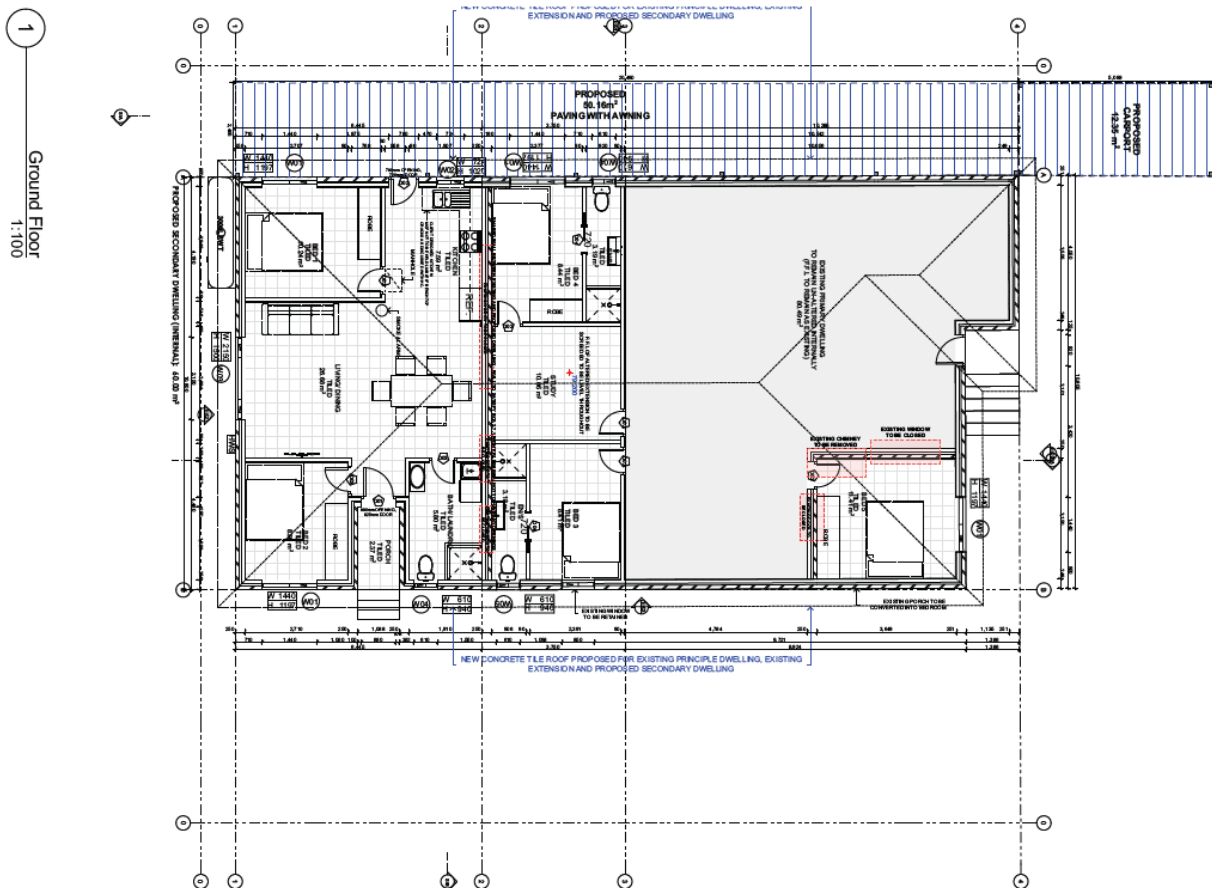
is the floor plan lodged in the development application DA 2018/0805, while Figure 4 is the proposed floor plan for the modification of the approved consent.
